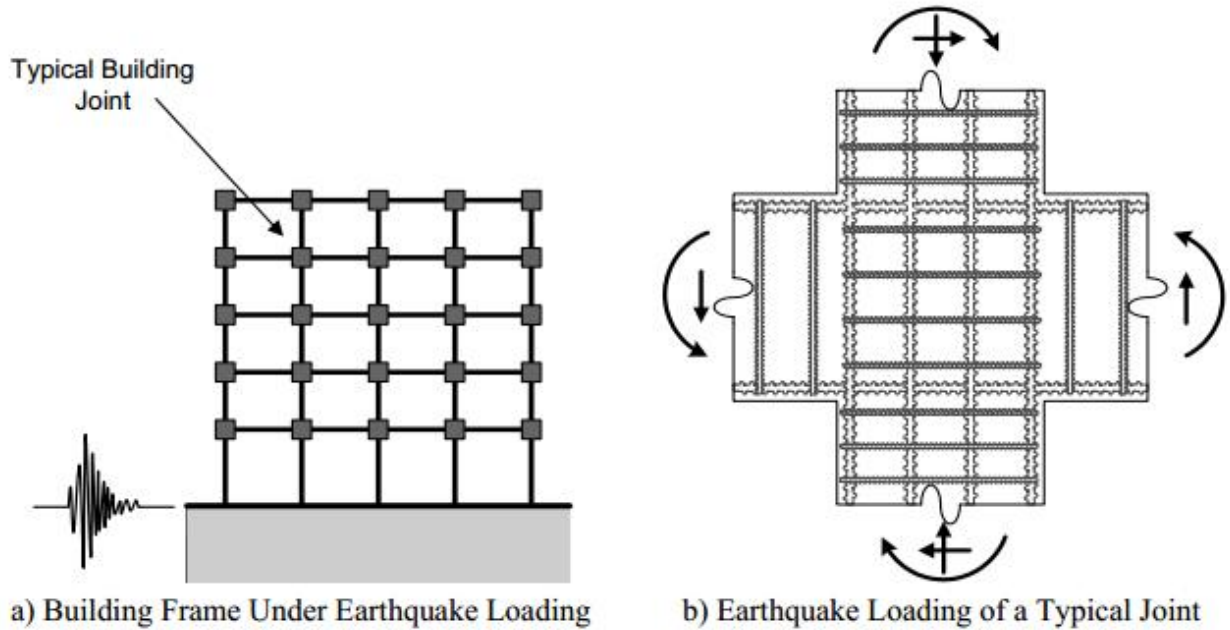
Beam column joint loads under earth quake loading (Laura et al. (2003))
